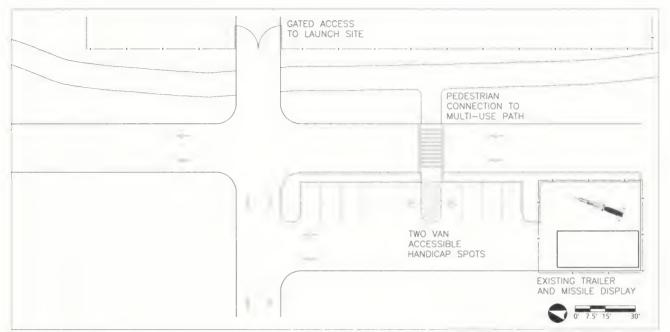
Plan for reconfigured visitor parking lot, NIKE launch site. The existing parking lot should be reconfigured to provide handicap accessible parking, a pedestrian crosswalk across Hartshorne Drive, and access to the site via the existing multi-use path (Olmsted Center, 2009).
